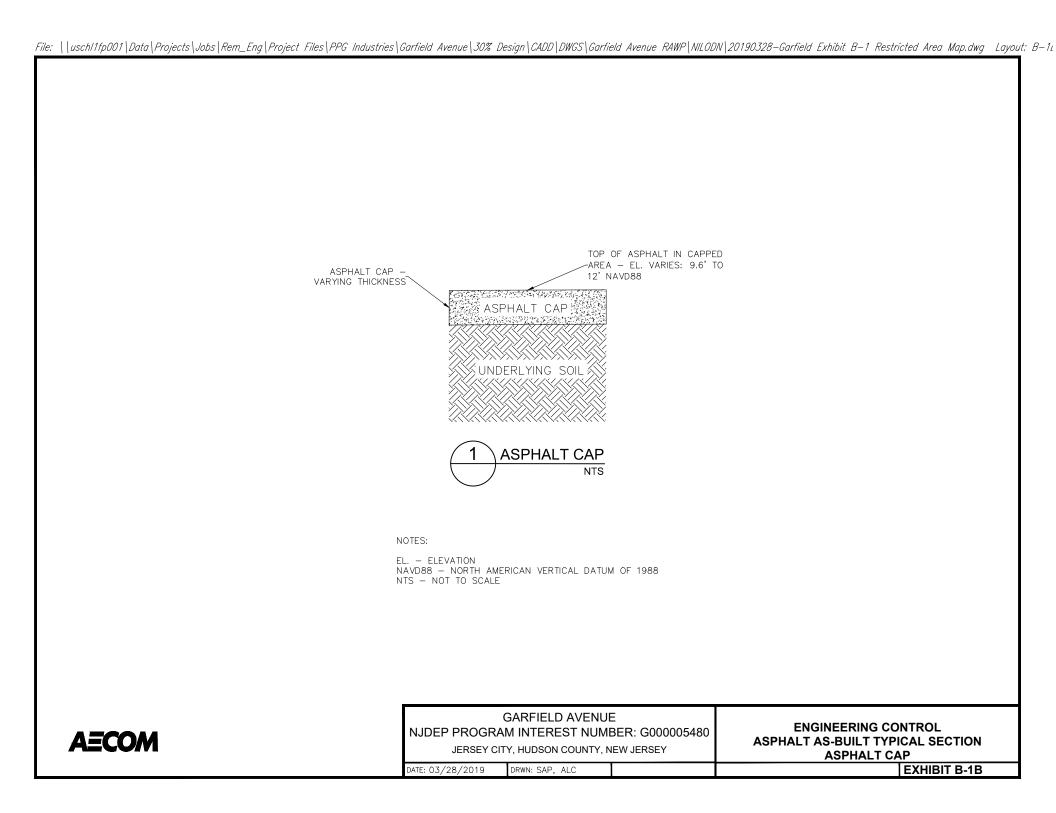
B: Engineering Control – As-Built Typical Section – Asphalt Cap
